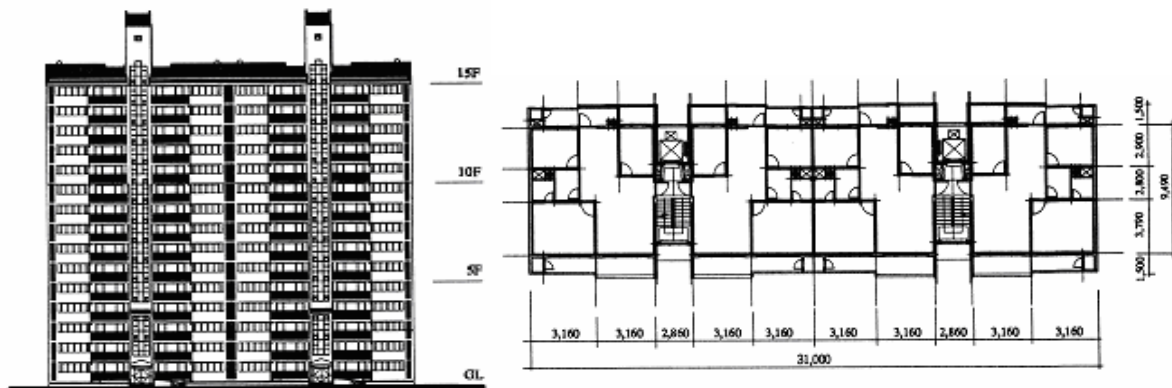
ELEVATION AND PLAN VIEW OF TYPICAL RC APARTMENT BUILDING IN SOUTH KOREAN DATASET
